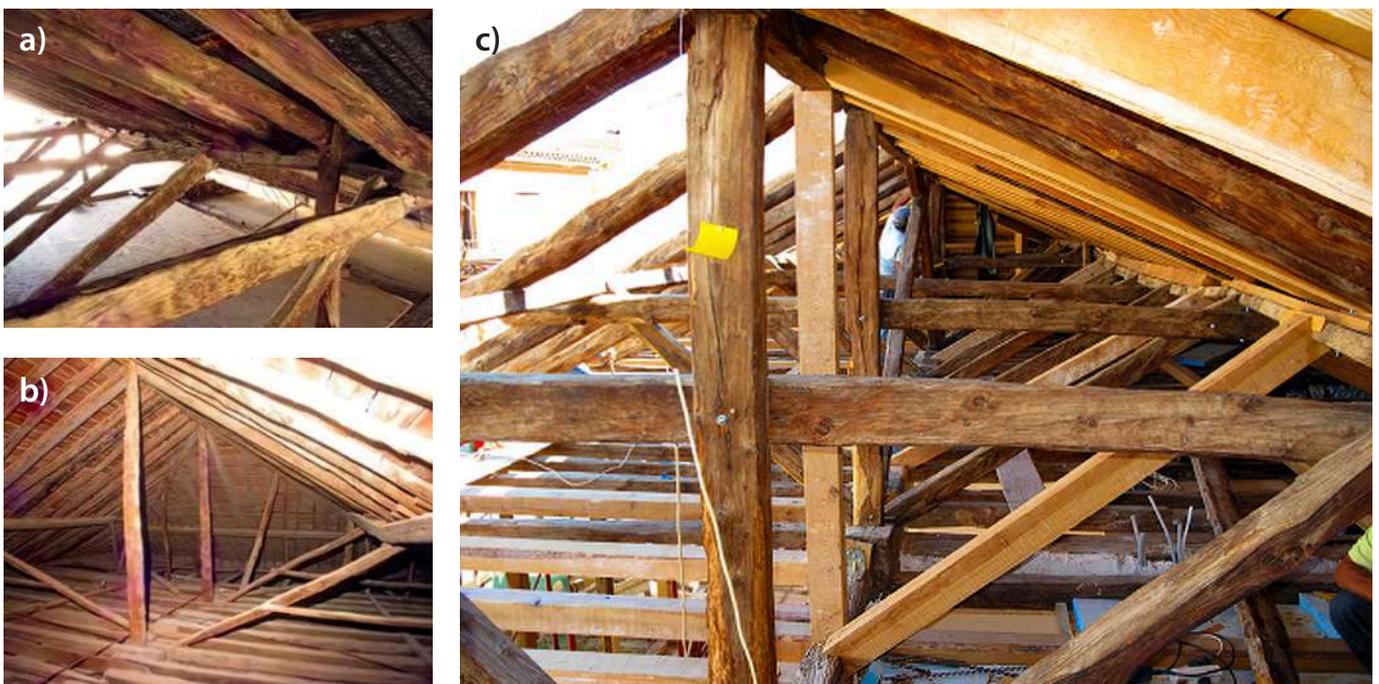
“Post and beam” roofs of the Ottoman period mansions in Greece. Excessive deformation of the longitudinal horizontal beams that support the rafters (a, b) [17]. Reinforcement by adding new timber posts and struts to increase the supports of the longitudinal beams that carry the rafters (c) [18].
